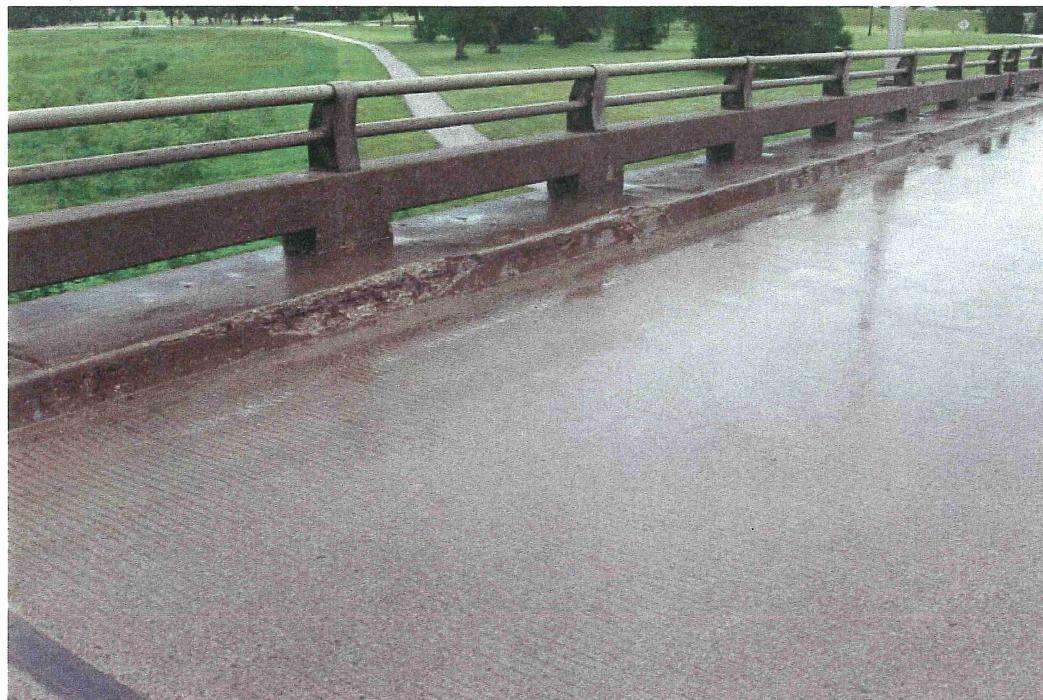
Span 11, north curb line, approximately 25 feet of spalled curb with exposed rebar.
